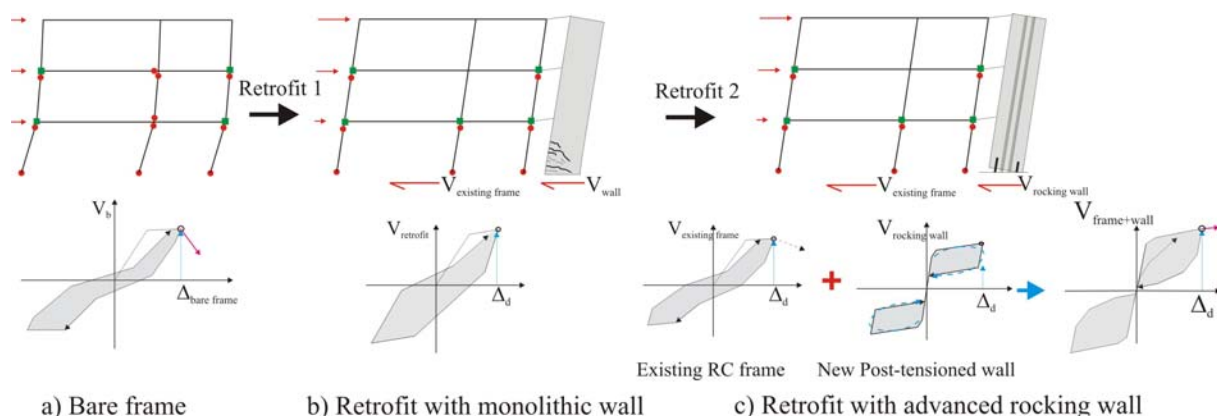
Comparison of retrofit intervention having either a monolithic wall or advanced rocking wall
